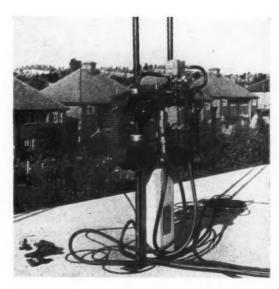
The hydraulic jack used for slab lifting. This one is shown on top of a concrete column at the lift slab store building erected by the builders in their own yard immediately before the Birmingham flats project.
